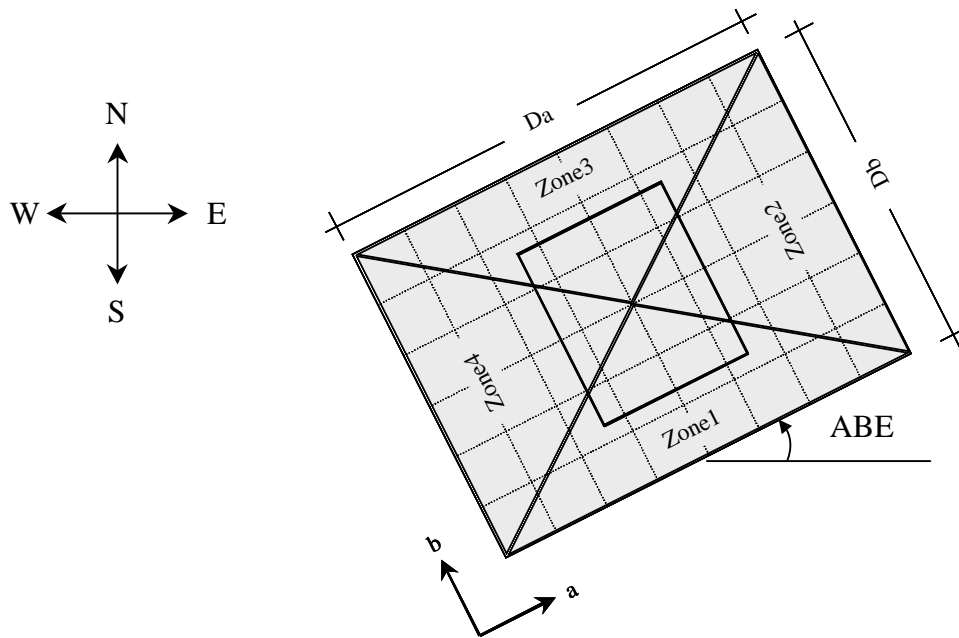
A.14: Air Conditioning Zoning for a Typical Building
